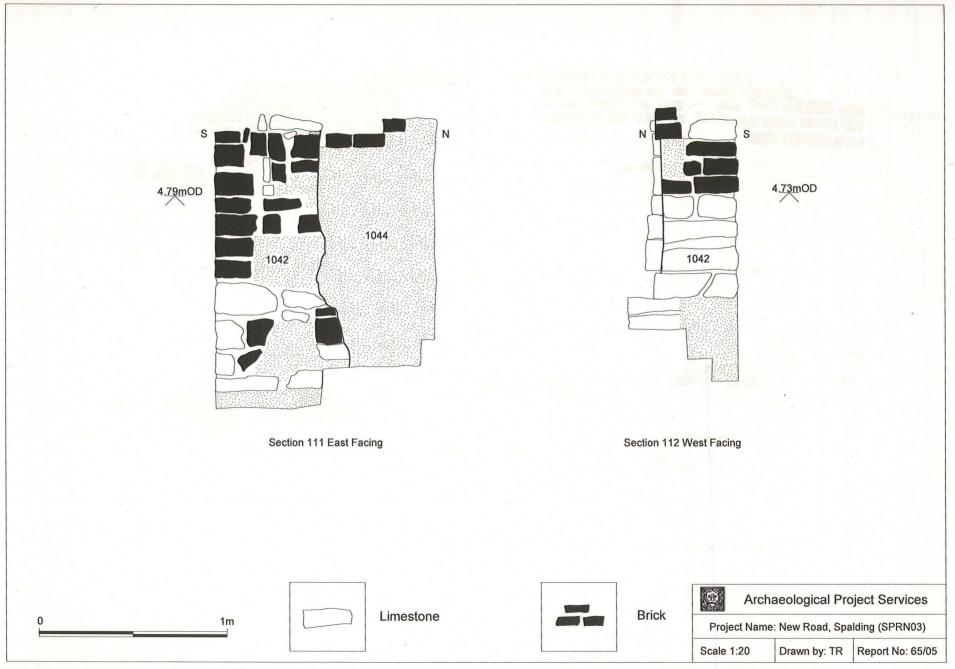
Sections 111 and 112, East And West Facing Walls Of Stairwell
